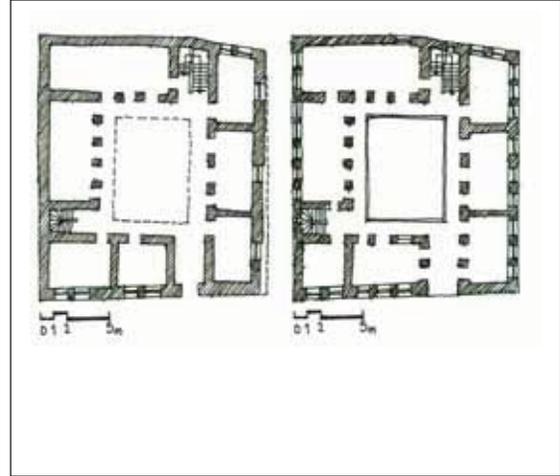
The ground and first floor plan of Rashidi's house. Adapted from Ghazban-pur 1375, 24.
